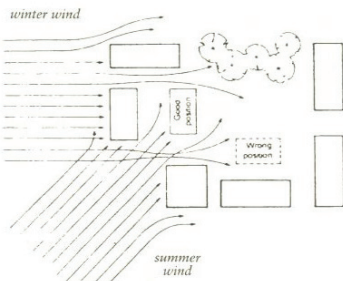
Example of good and bad locations of a building on an urban site, with respect to wind
